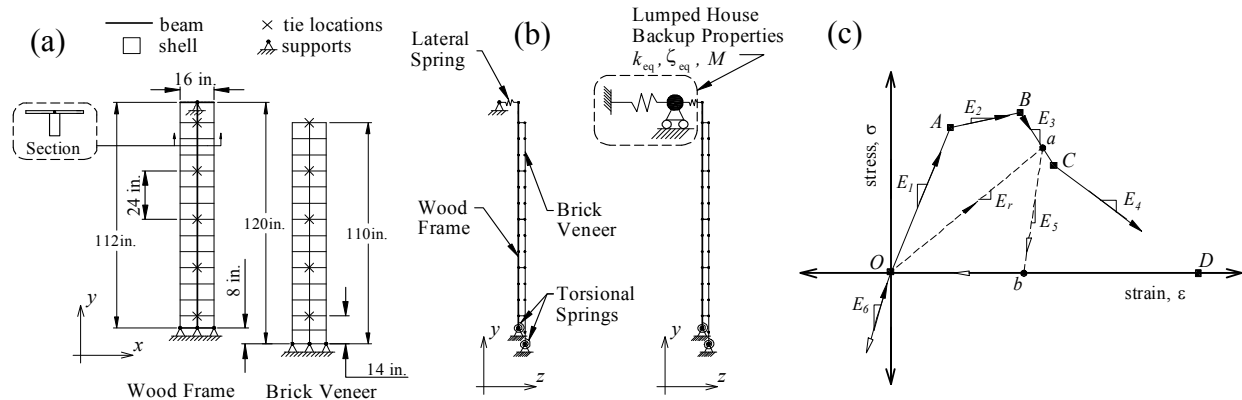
(a) Front view of simplified 2-D wall strip model representing a single-story solid brick veneer wall panel. (b) Side view of wall strip without and with lumped properties representing a house backup structure. (c) Tie connection hysteresis model.
